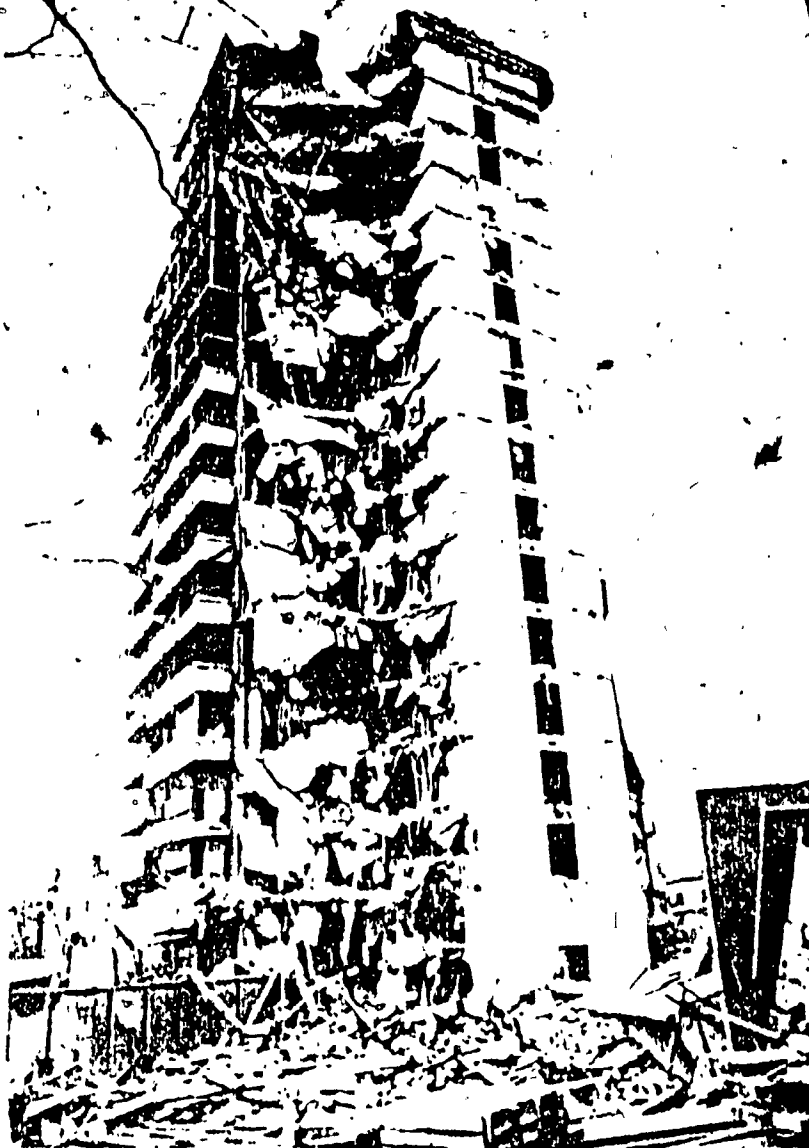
Progressive collapse during construction of reinforced concrete building. Boston, January 25th, 1970. [28]
